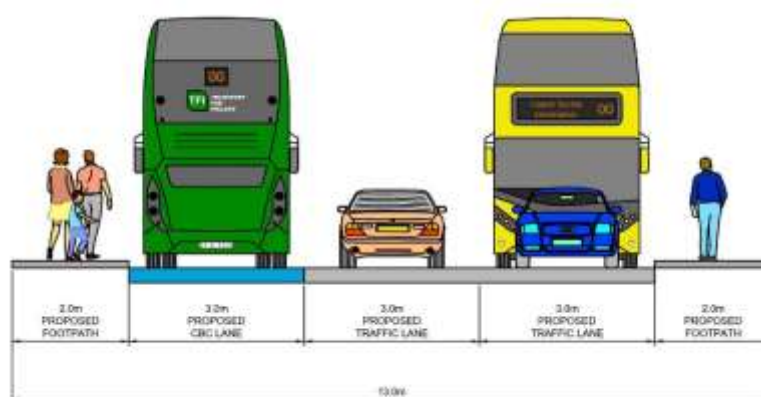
Typical Single Bus Lane Cross Section (C – C)
